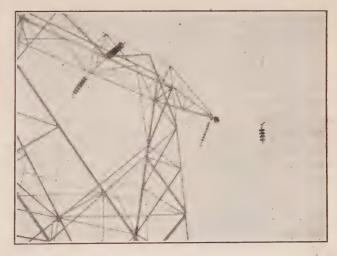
LINE DAMAGE, TOWER No. S22, LOOKING NORTHWEST
